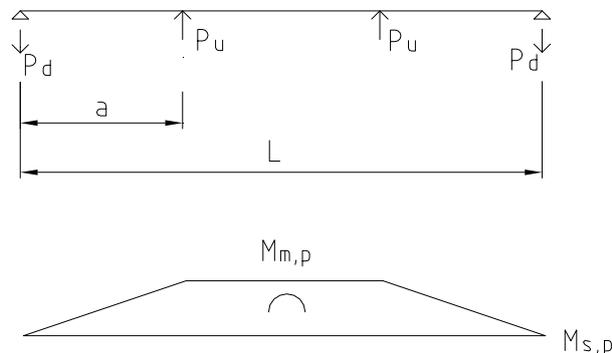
Structural schematisation of the box girder subjected to prestressing forces
